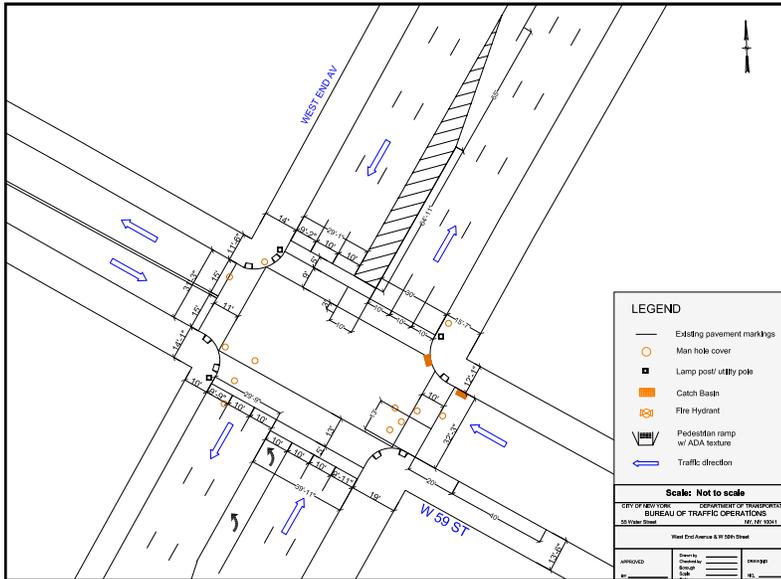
Existing Condition - West End Avenue & West 59th Street
